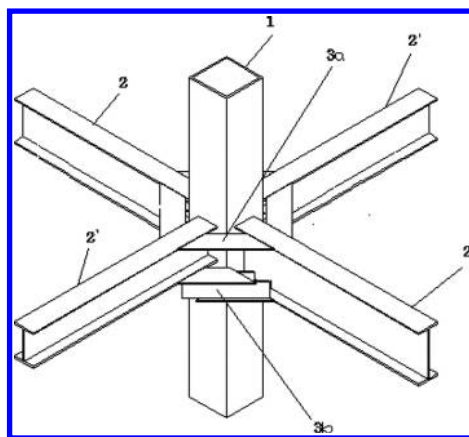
Joint transferring beams' forces outside box columns with different beams' height.
